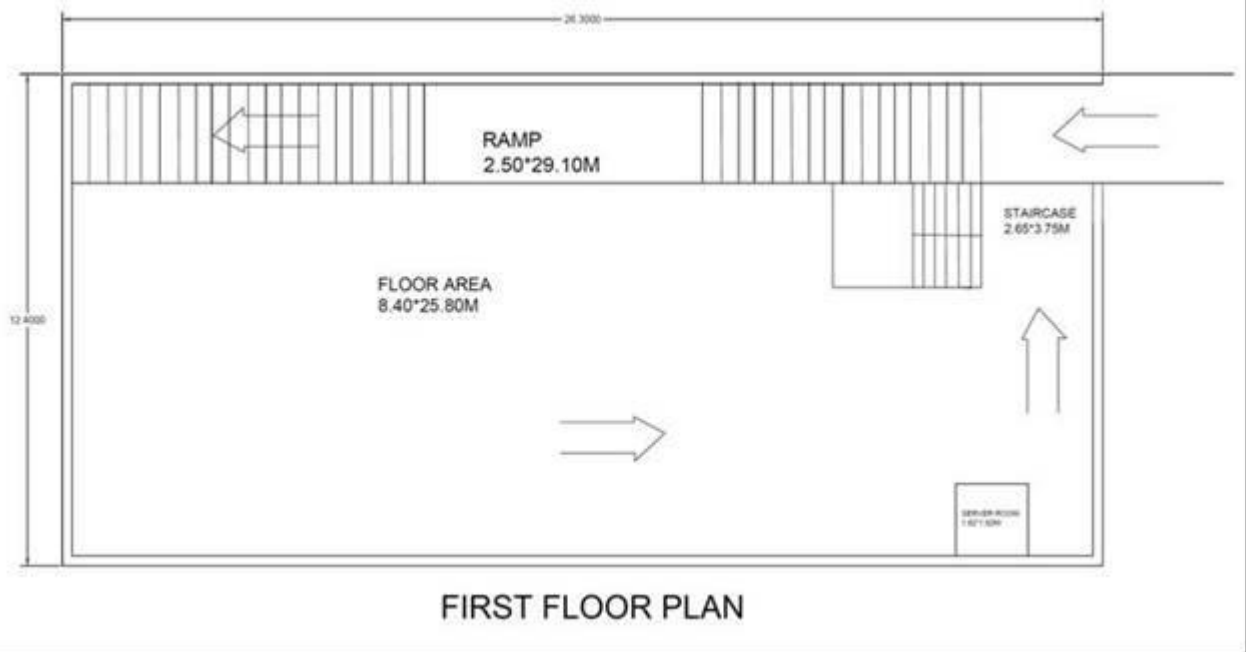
Parking Location: First Floor Plan, Rajpayga Multi Level Parking
